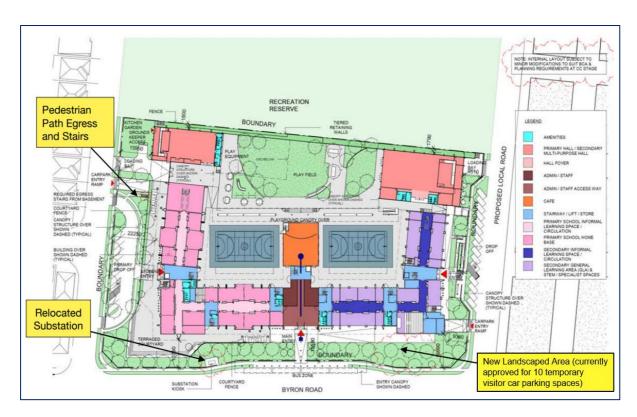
| Proposed modifications at ground level (Source: Applicant's Modification Report)
